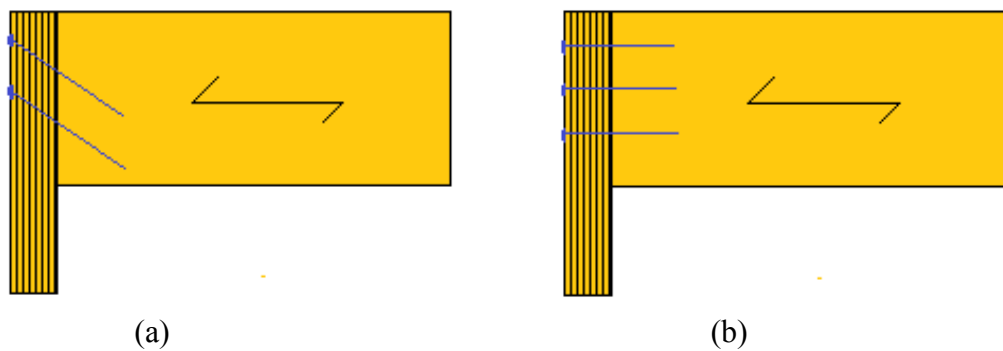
Screwed beam-to-beam on-side connections: (a) inclined screws connection and (b) screws/nails driven perpendicular to a gable (Source: Kovanen, H. 2014)
